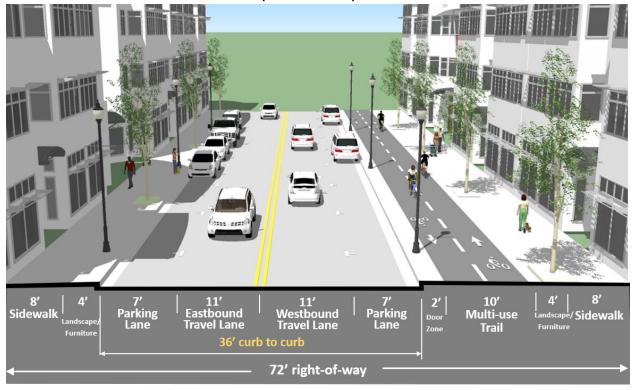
HUDSON BOULEVARD EXTENSION (LOOKING WEST)
